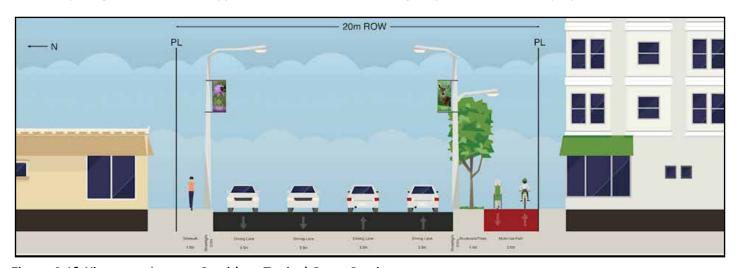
Kingsway Avenue Corridor - Typical Cross Section
